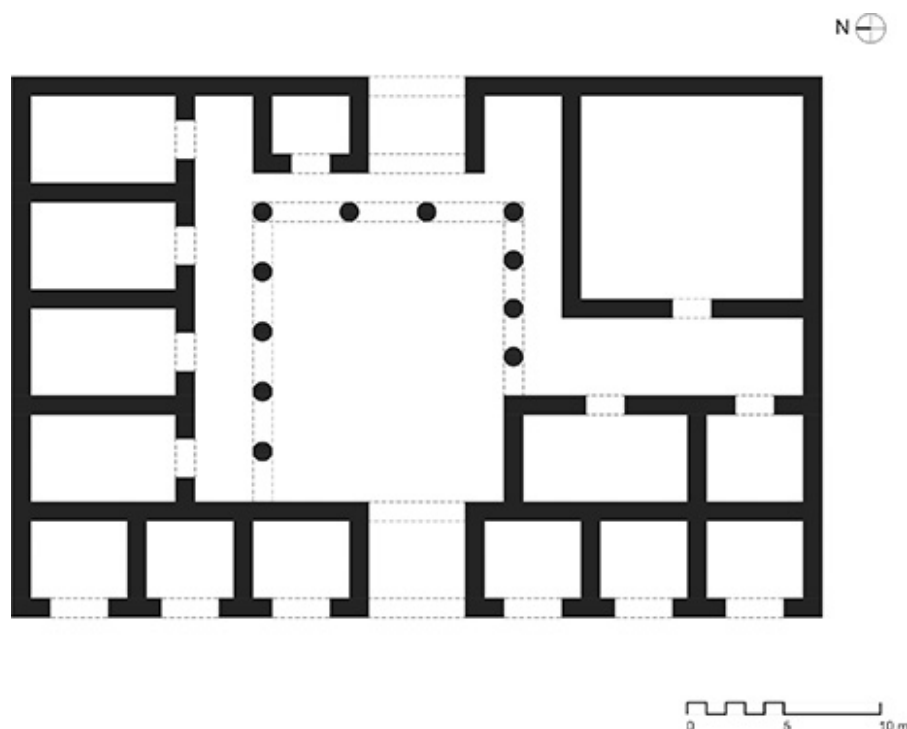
Partly hypothetical floor plan of the khan in Jeddah. Five houses and a primary school were located on the upper floor of the khan, around the courtyard (drawn by Erkan Torun).
